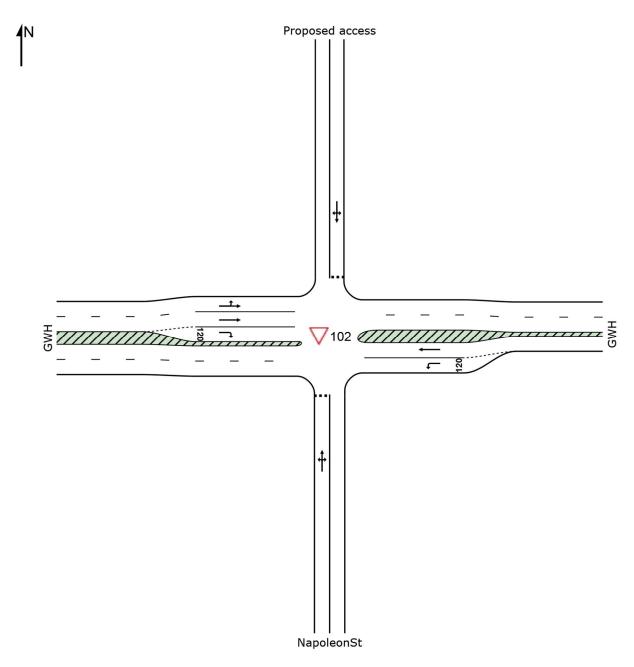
Modelled future intersection layout – Great Western Highway / Napoleon Street
